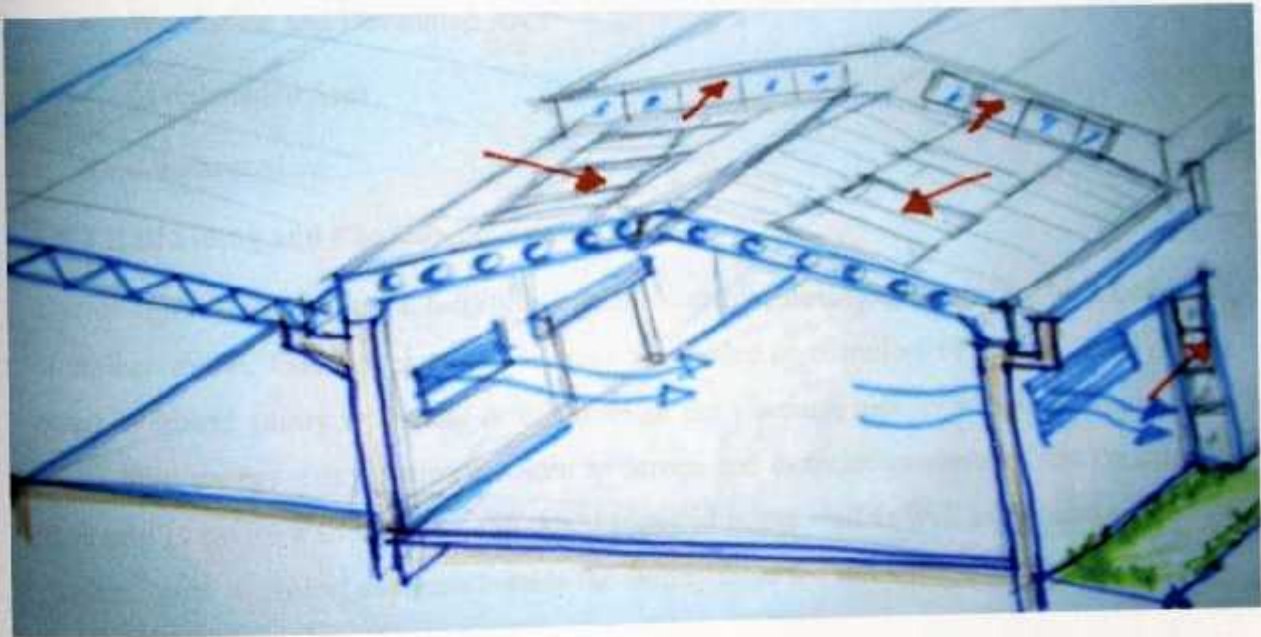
Sketch of ventilation and lighting analysis of warehouse area
